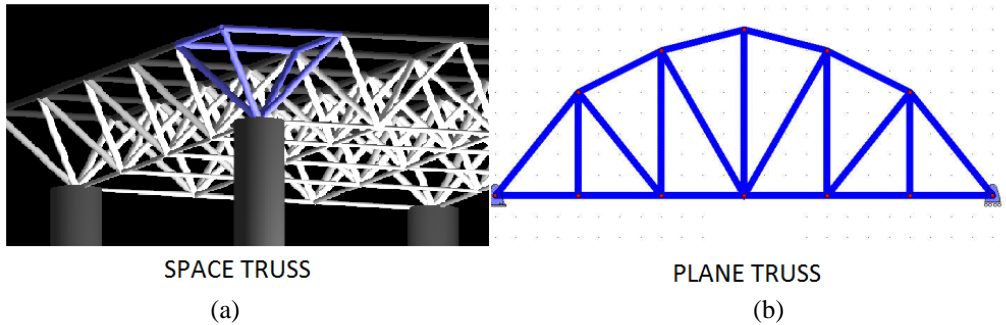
Visualization of a 3-D space truss (a) and 2-D plane truss (b).
